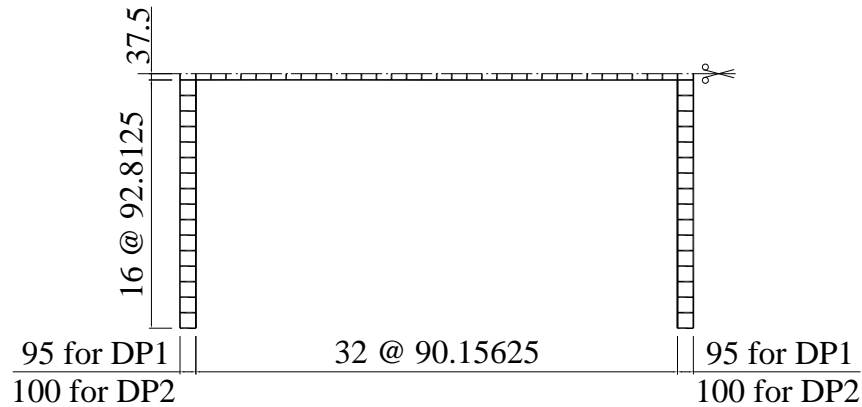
Cross section of VecTor3 model for Palermo shear walls DP1 and DP2 (dimensions in mm)
